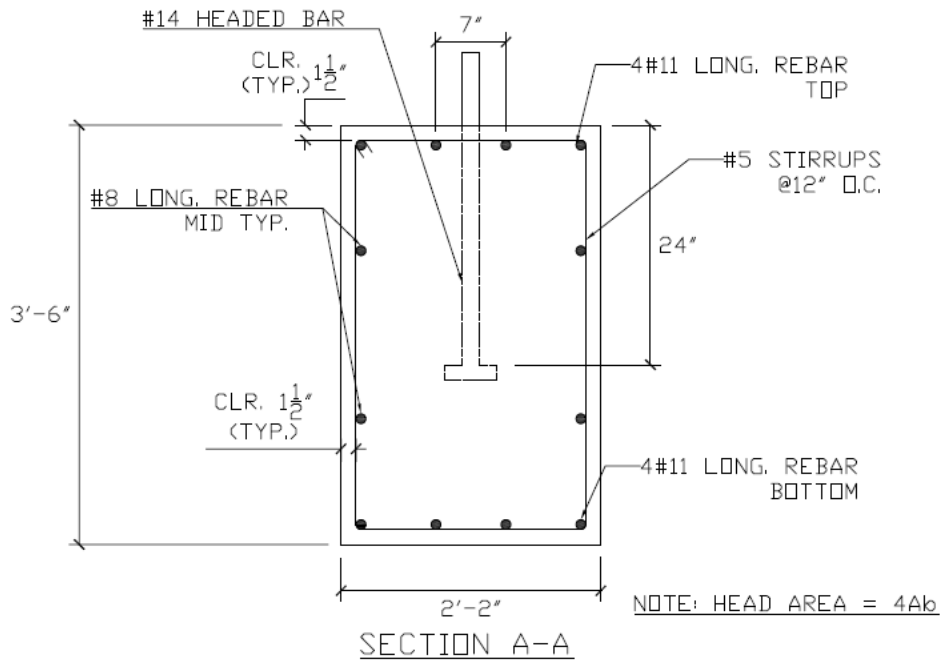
Cross-section view of Specimen 2 (Specimens 1, 3 to 7, 10, and 11 had the same design except for the bar embedment length, the head size, and that the four sets of stirrups closest to the headed bar in Specimen 5 were No. 4)
